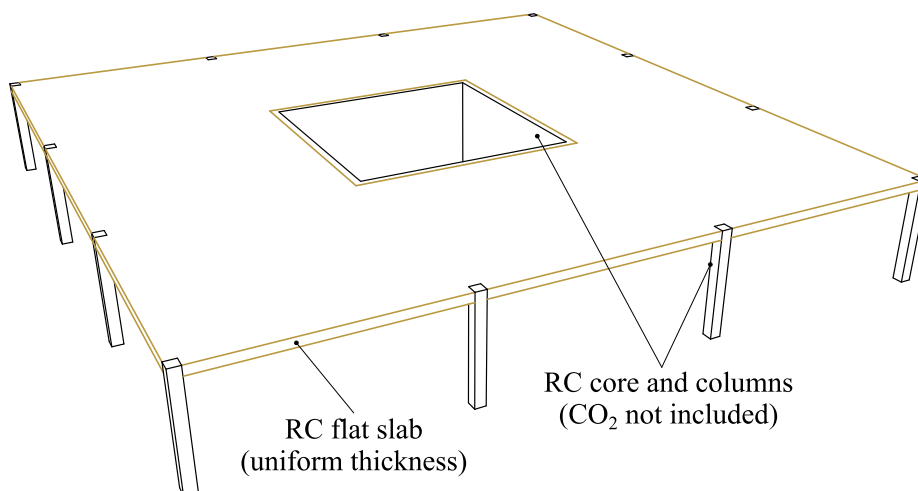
Reinforced concrete flat slab layout showing locations of columns and core.
